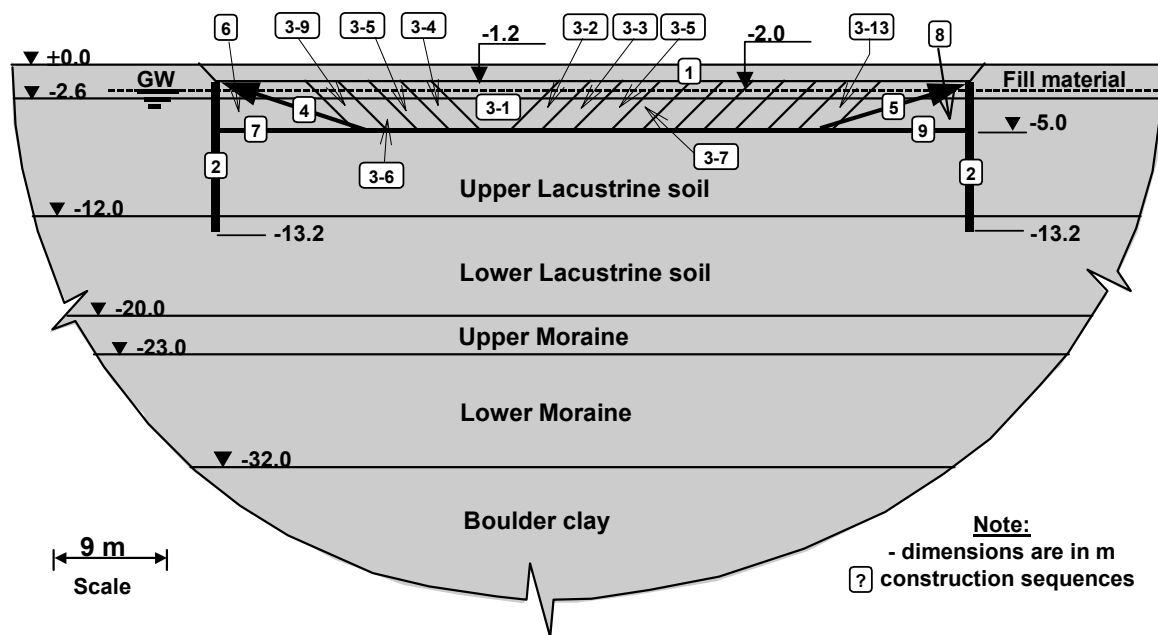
Section through the site (west - east), soil profile and construction sequence
